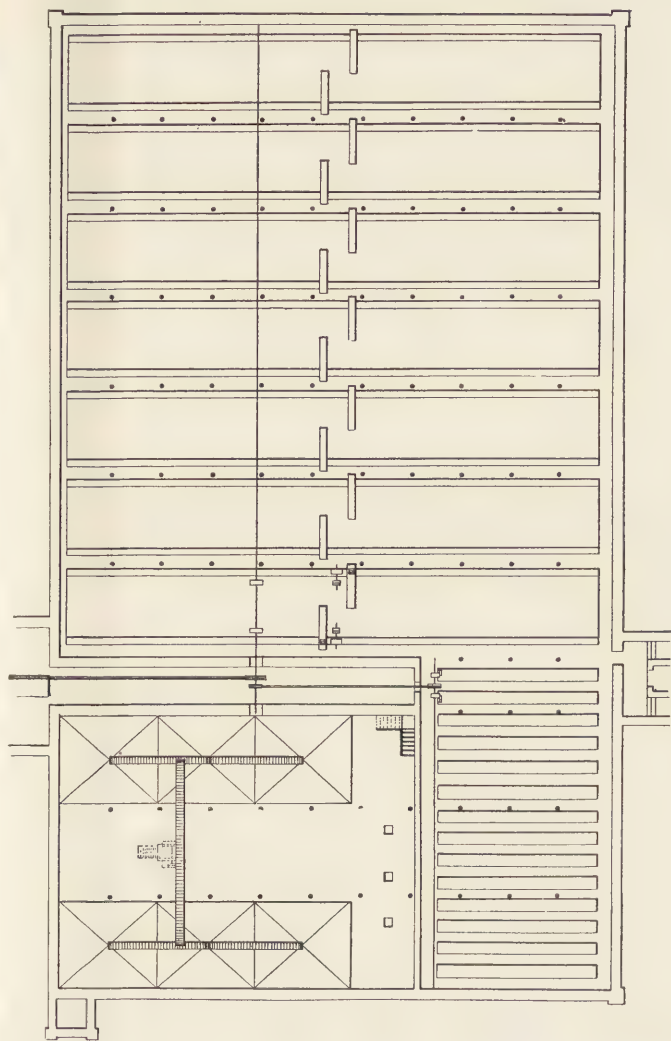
PLAN OF MILL FOR SPINNING AMERICAN COTTON. (Above ground floor.)
